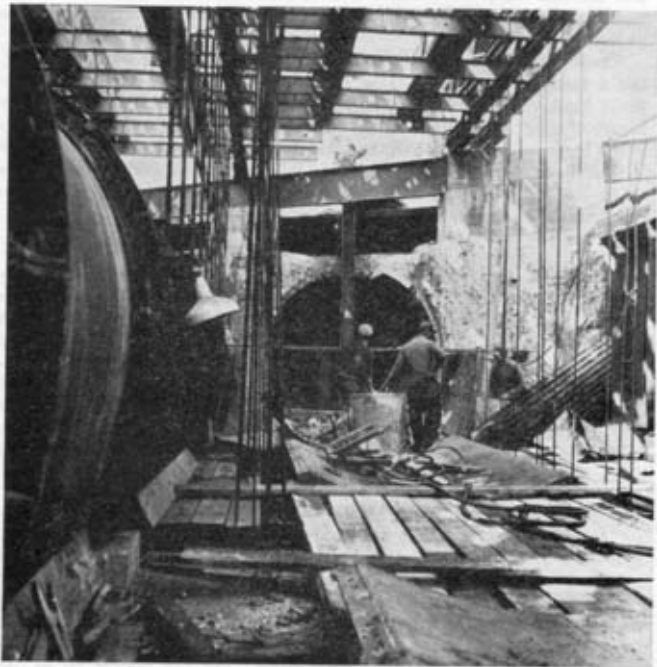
Demolition of the third sewer almost complete. A rebuilt sewer is on the left. A "shutter-sleeve" can be seen in position. One of the existing wrought iron girders is on the right.
